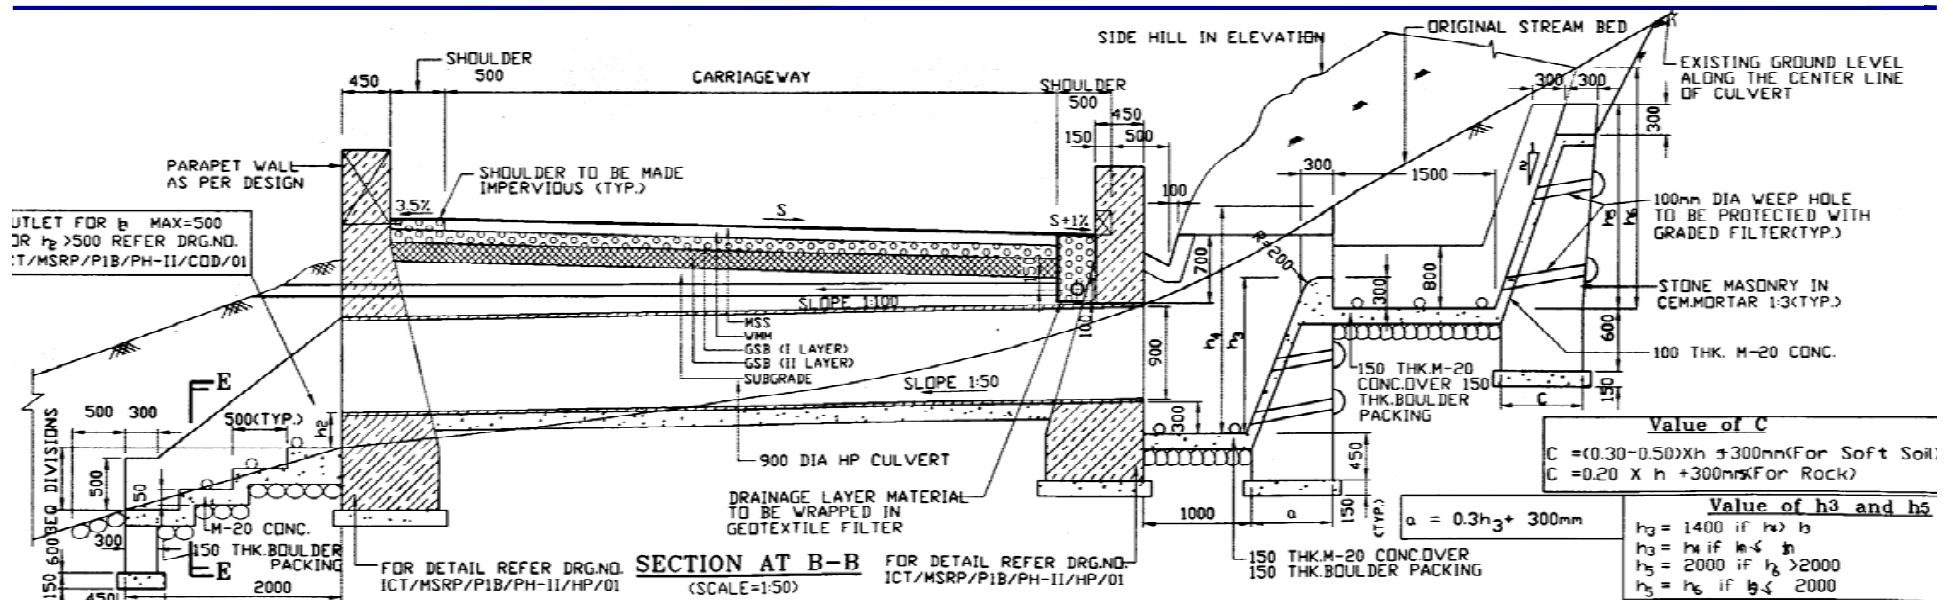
Showing Improved Inlet and Outlet Transitions for HP/Box Culverts
